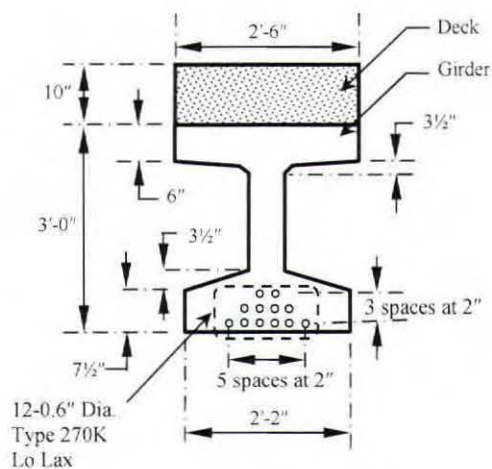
Cross Section of the Quartzite-Aggregate Girder
